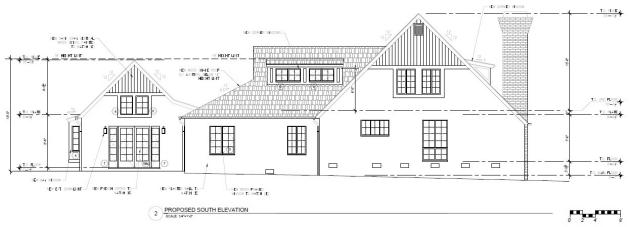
Rear main level addition of 652 sf shown on the left of the elevation (Source IX: 1).
